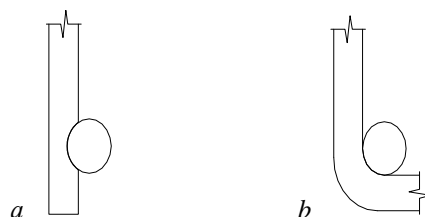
Connection of longitudinal and transverse rebar in the frame beams:
